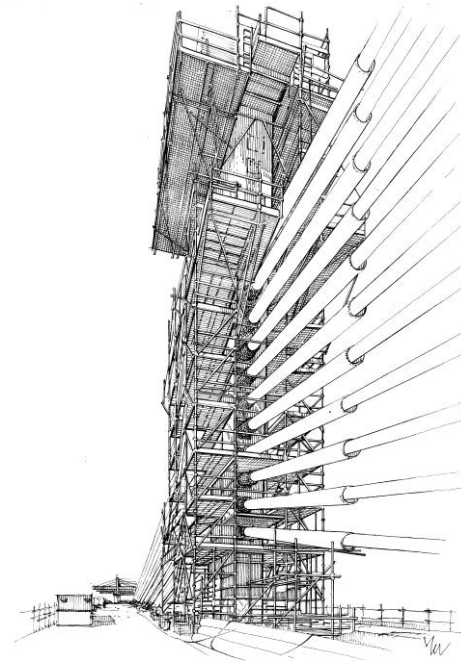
23rd January 2019. View of the main bridge construction from beyond the Eastern Abutment.
